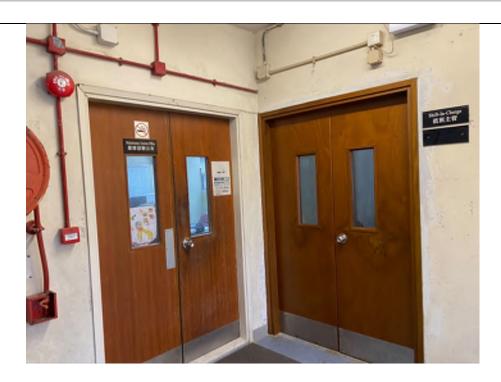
Old Administration Building – The second floor of the Old Administration Building is paved with concrete slab, the Maintenance Section Office is located on the second floor.
